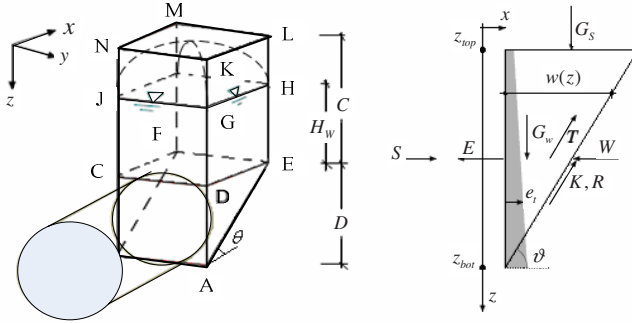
Wedge-loaded model of three-dimensional tunnel face failure mechanism by soil silo
